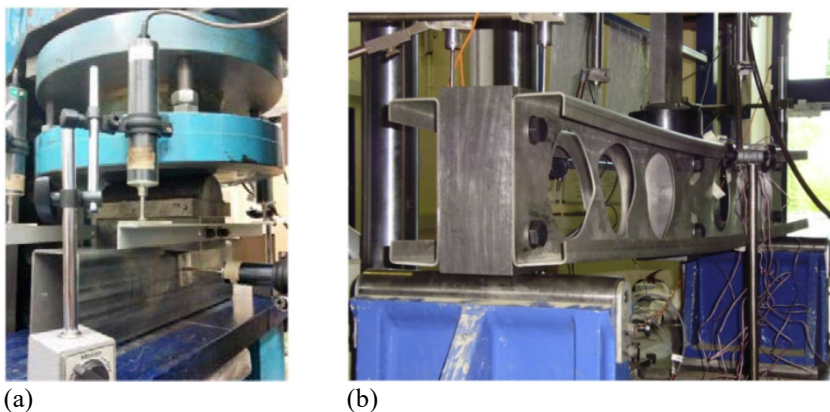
Cold-formed stainless steel bearing members; (a) Tubular section after Li and Young (2017a); (b) Lipped channel-section after Lawson et al. (2015)
